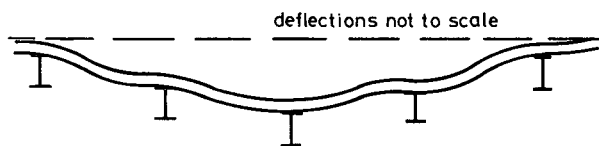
Cross-section of vibrating floor structure showing typical fundamental mode.
